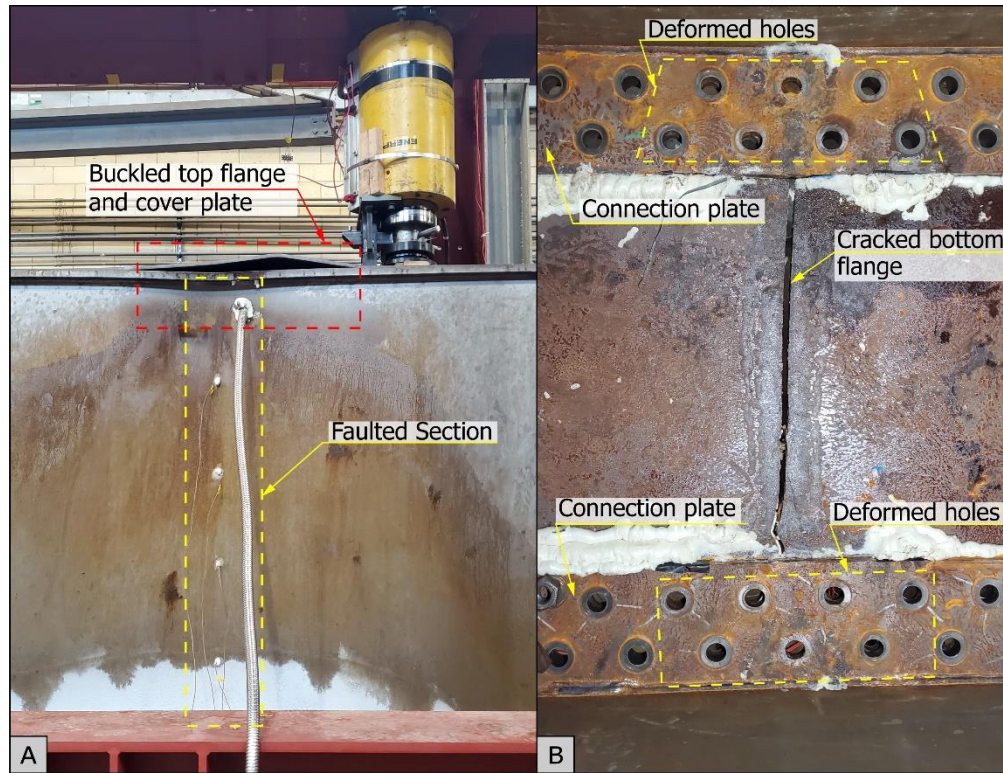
Specimen B1 Ultimate Strength Test: (A) Buckled top flange and cover plate, and (B) bottom flange crack and flange connection plates (bolts removed) after final loading.
